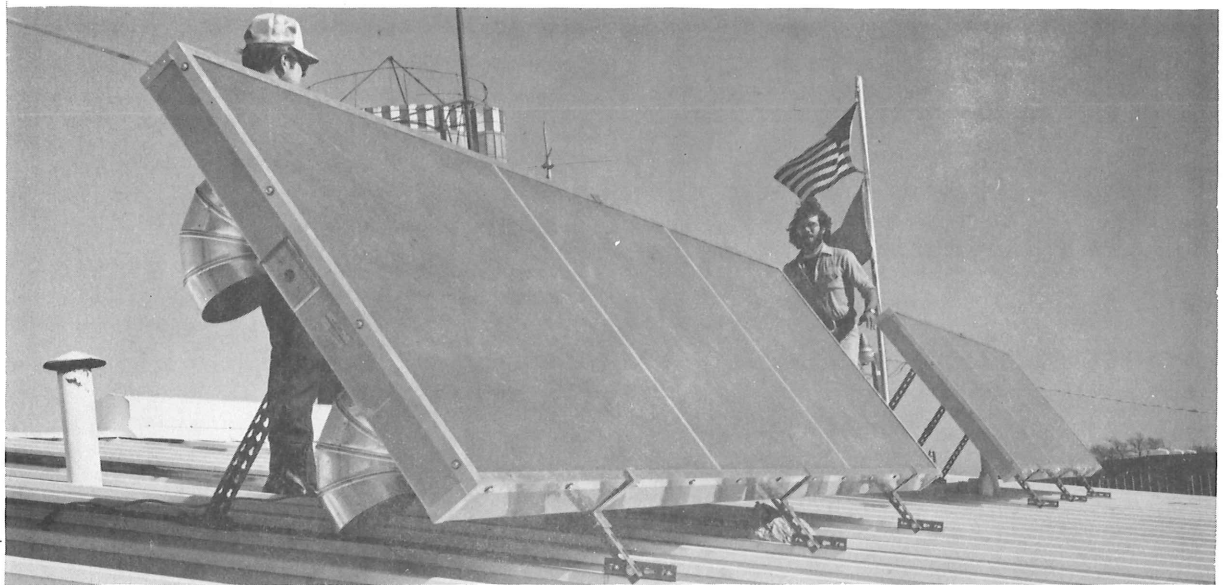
Front view of collectors bolted to roof prior to connecting duct work.
